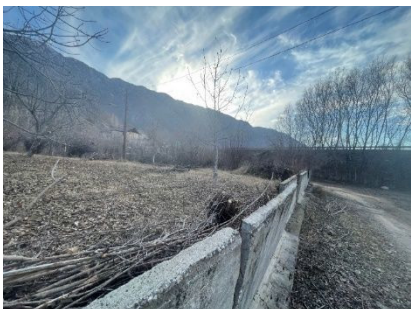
Concrete Fence in Land Plot (No.3)
